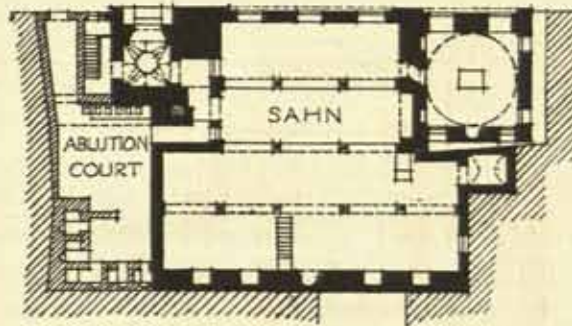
CAIRO: MADRASAH OF JĀNIM AL-BAHLAWĀN. PLAN
